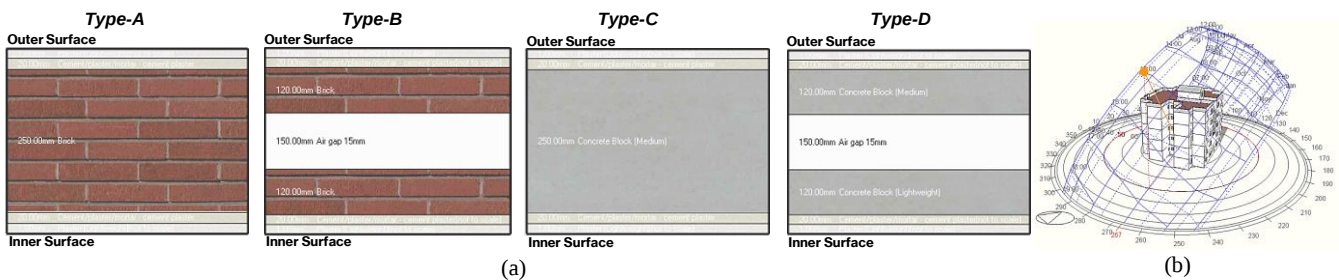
(a) structural layers of tested external wall types, (b) sun path in relation to tested building.
